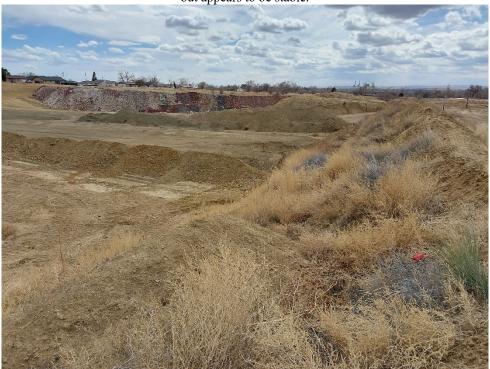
The right side of the photo shows the north-south berm around the affected area, looking south. Slopes are at angle of repose but appear to be stable. The discarded brick stockpile, topsoil stockpile, and product stockpile can be seen in the background in the center and left of the photo.
